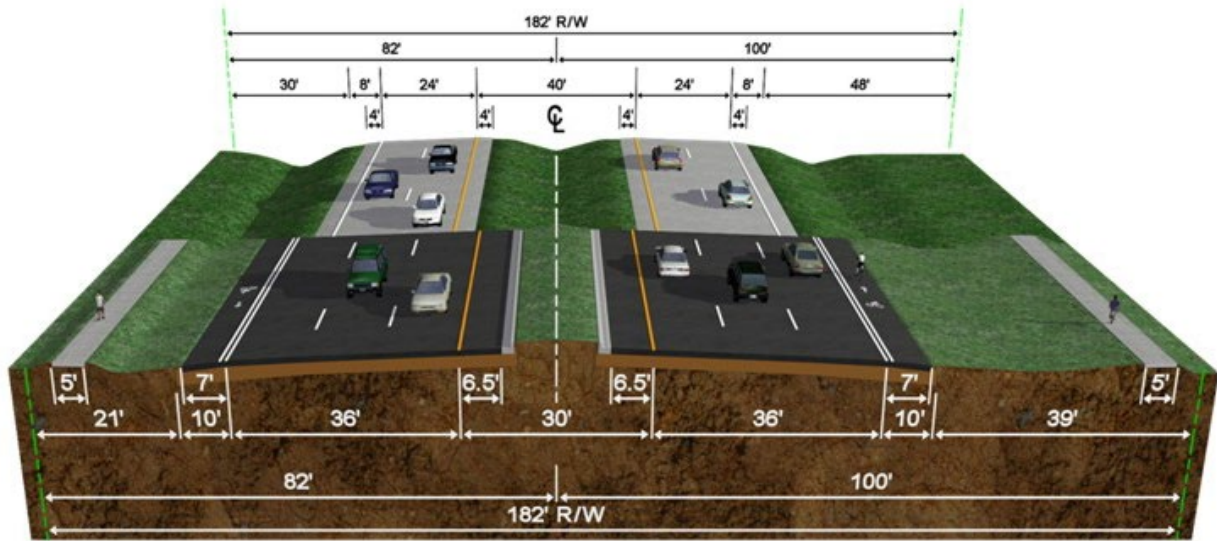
| Proposed US 41 Roadway Typical Section - South of Riverview Drive to Denver Street
